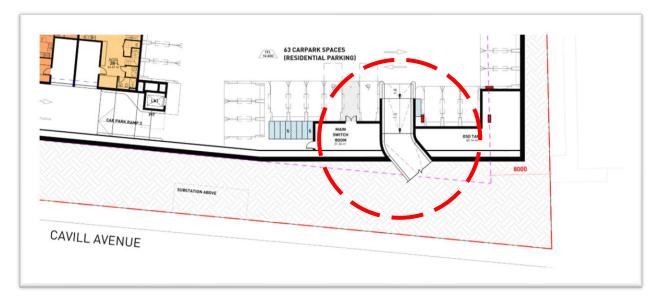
Highlighting single lane driveway exit providing vehicular access from/to Cavil Avenue.
